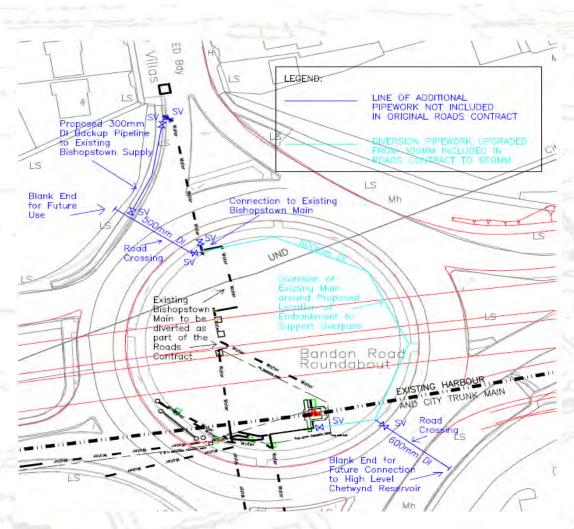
Proposed Works at Bandon Road Roundabout (To be undertaken as part of the Roadworks Overpass Contract)
